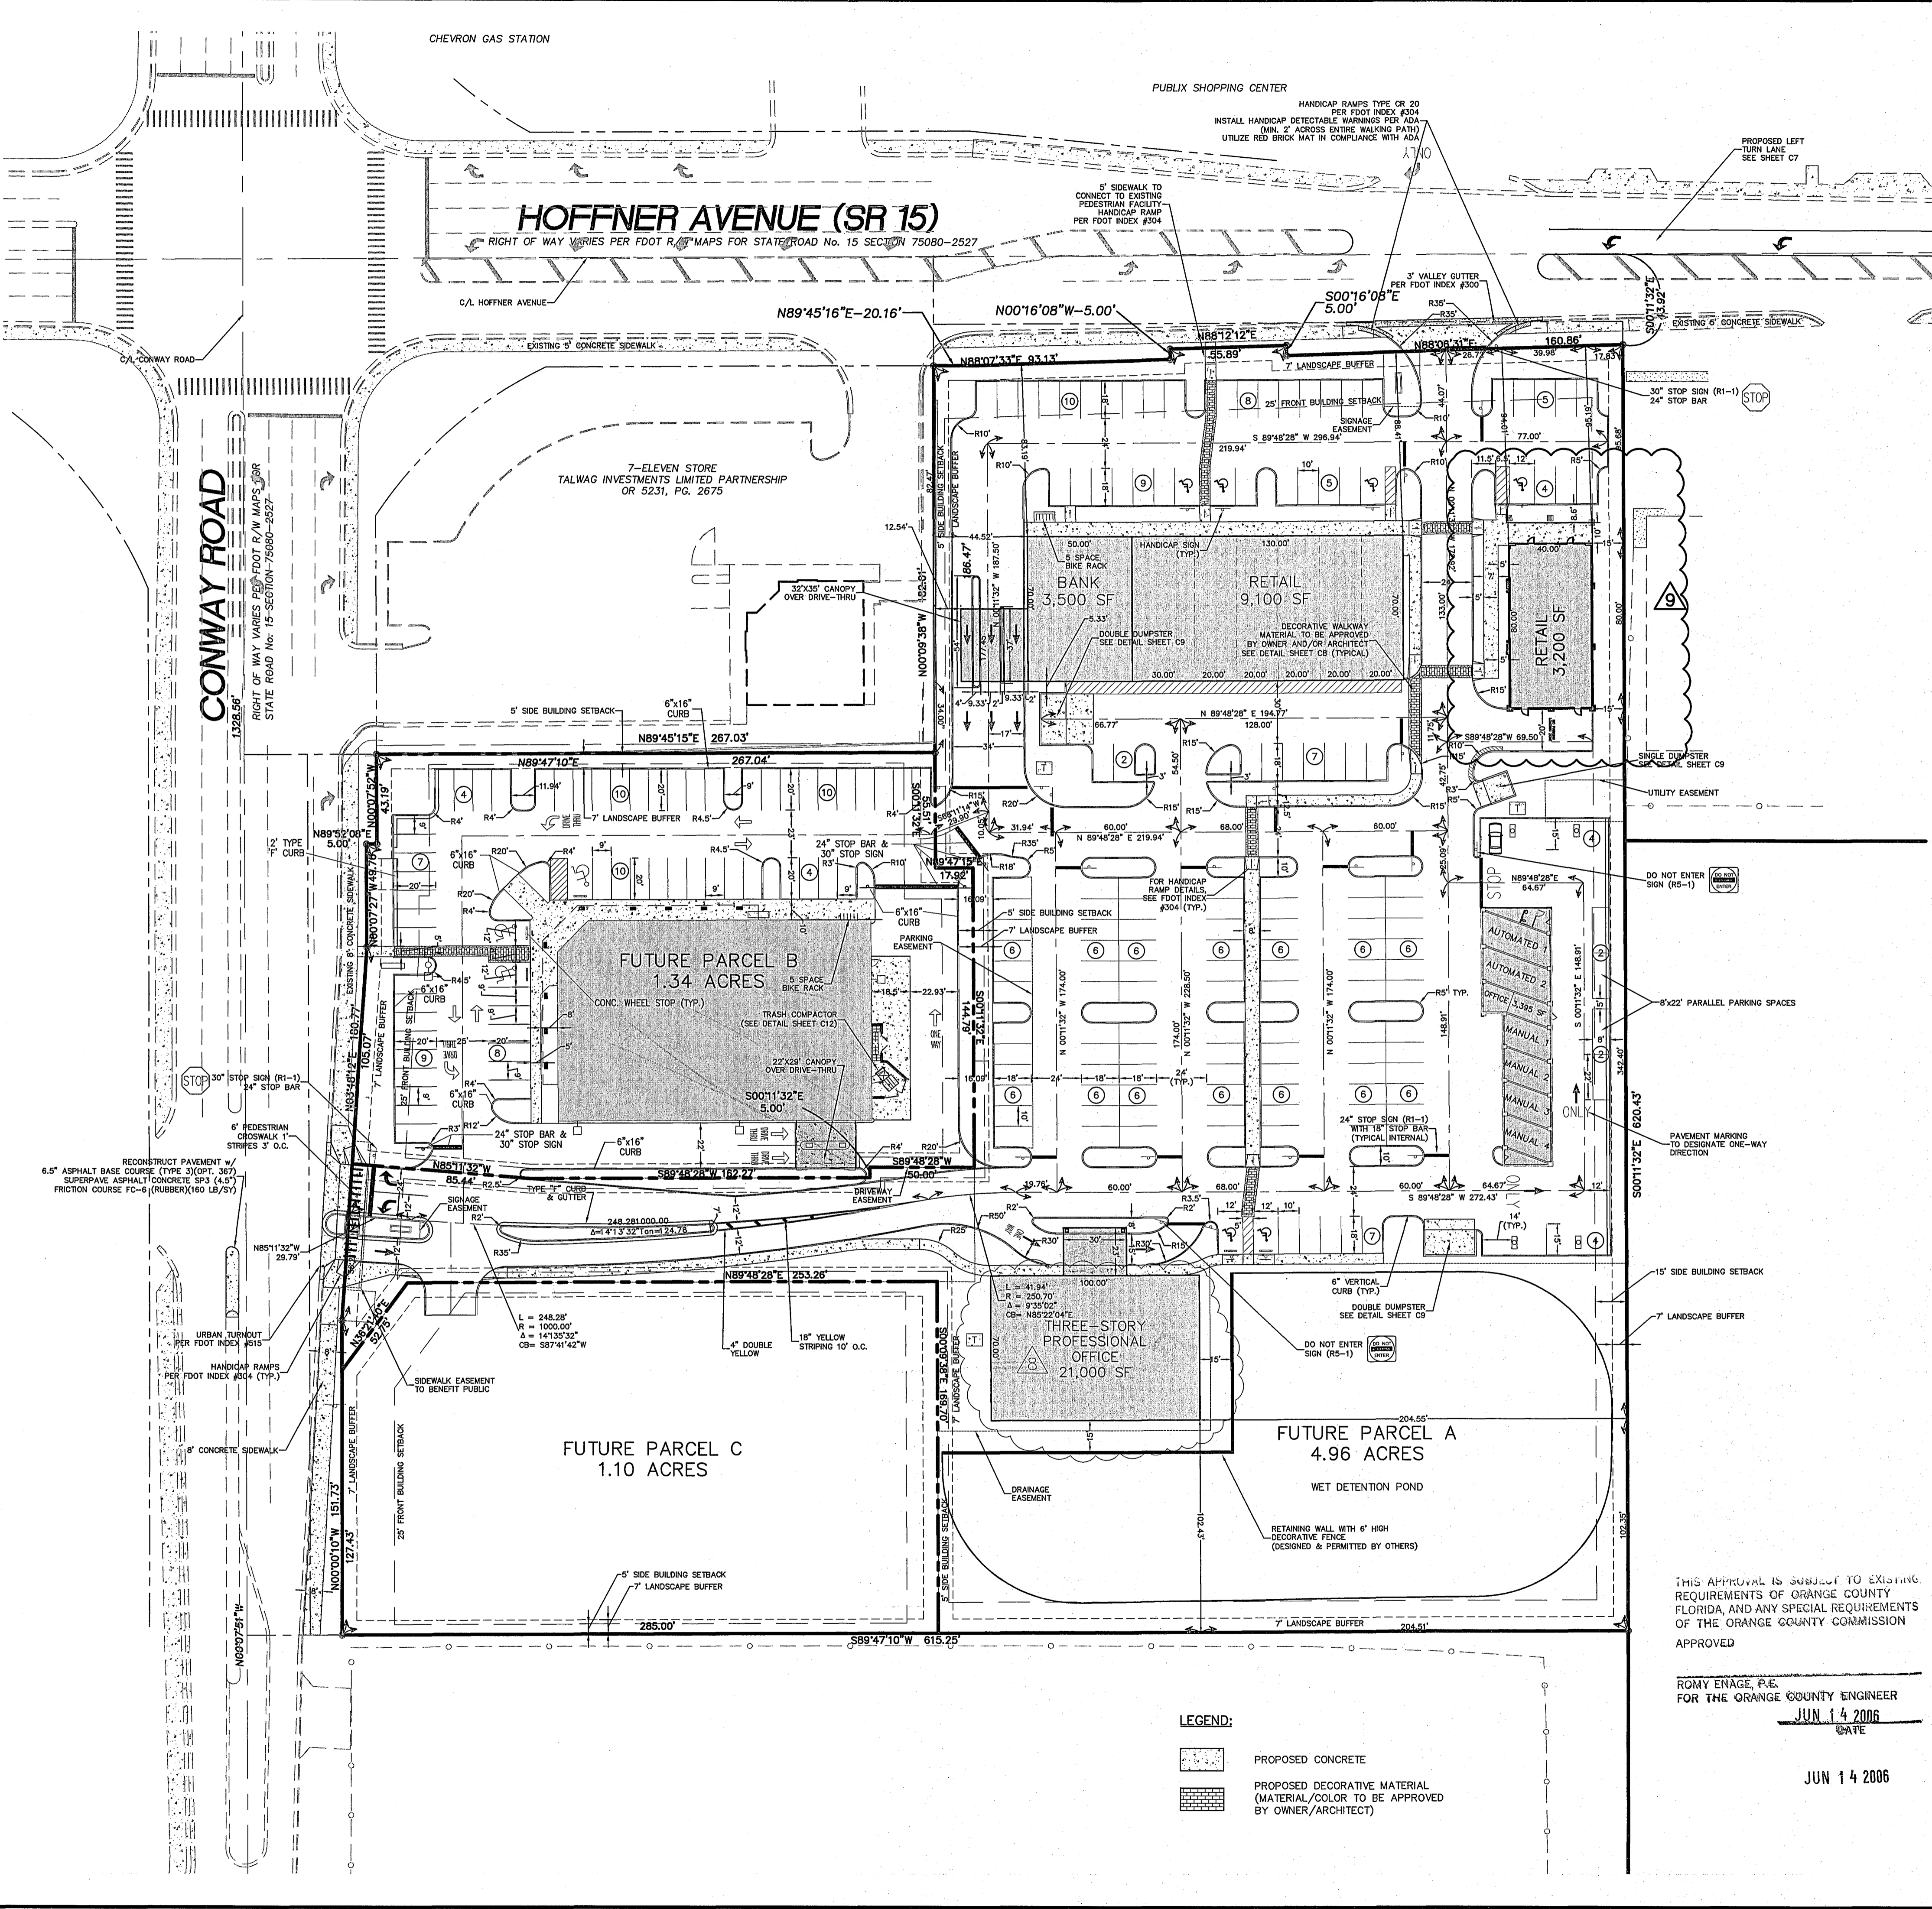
Drawing name: G:\049162002 - Hoffner Commons\CADD\CONSTR\C04-SITE.dwg SITE PLAN May 24, 2006 8:31am by: dori.christian
